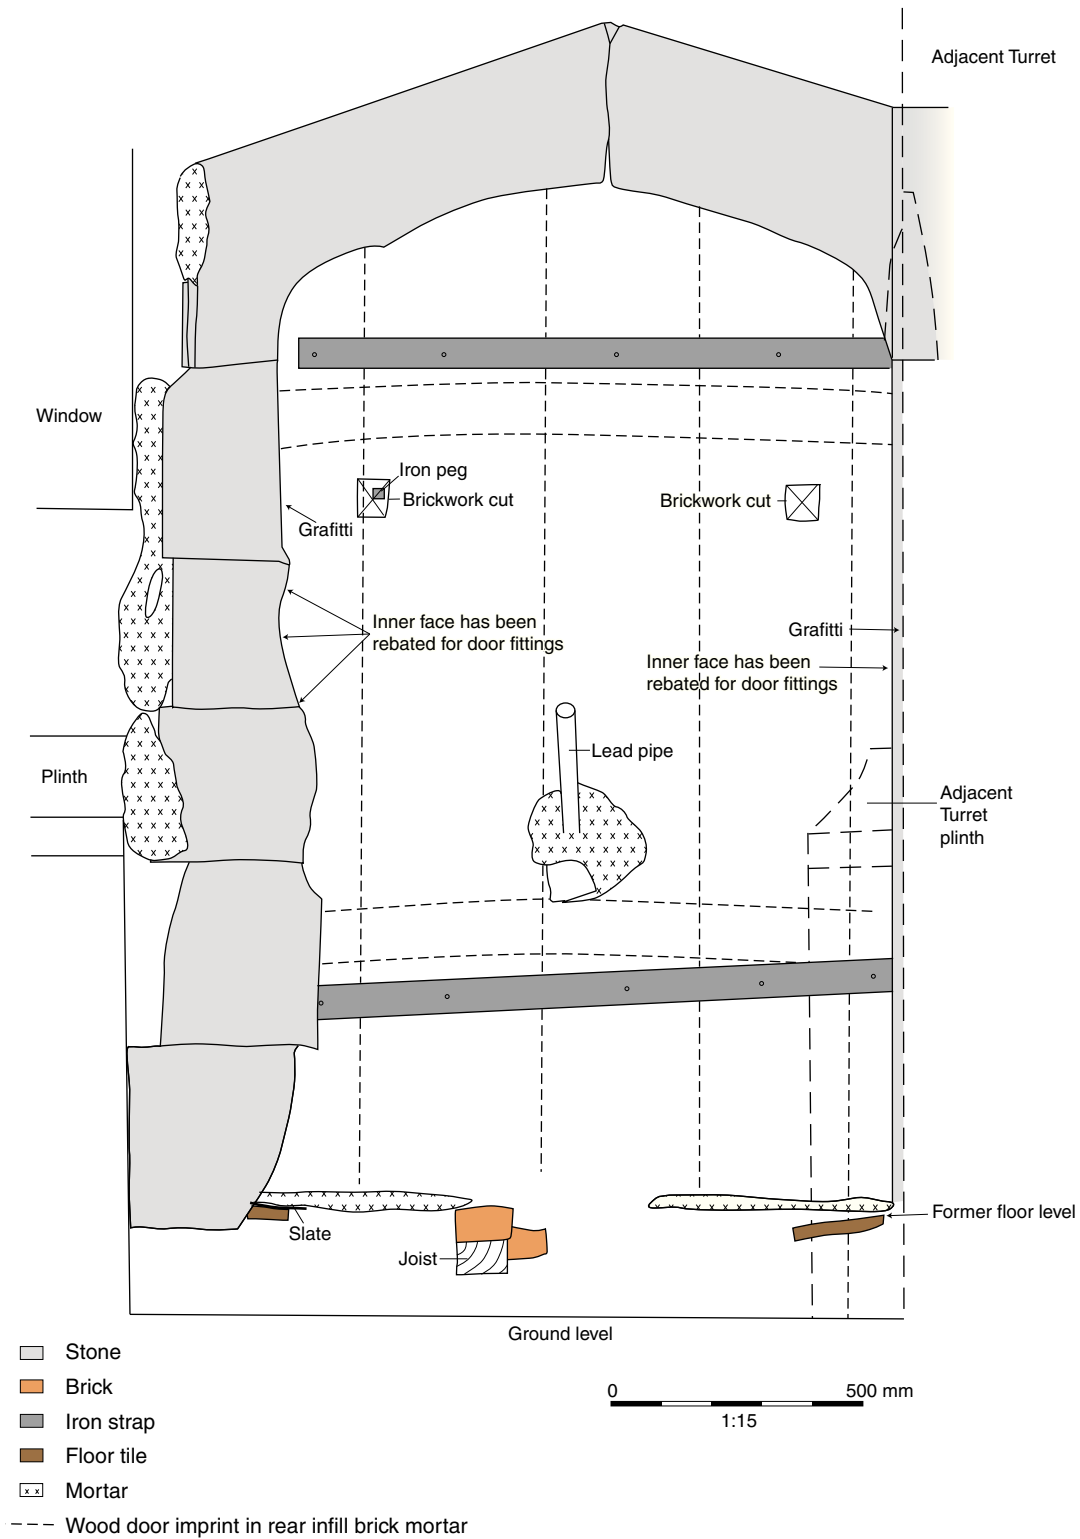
Blocked door on north elevation (rear infill brickwork omitted for clarity)
